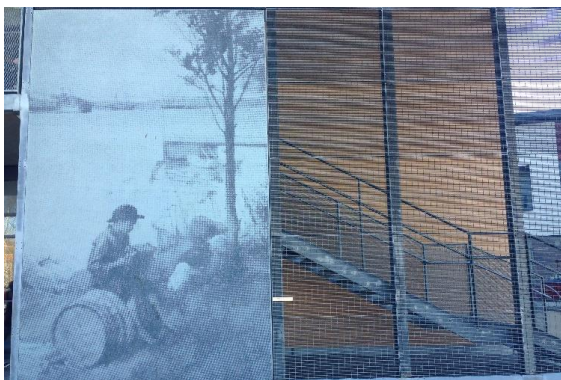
Artwork created on a Precast Concrete Wall^{24.6}
